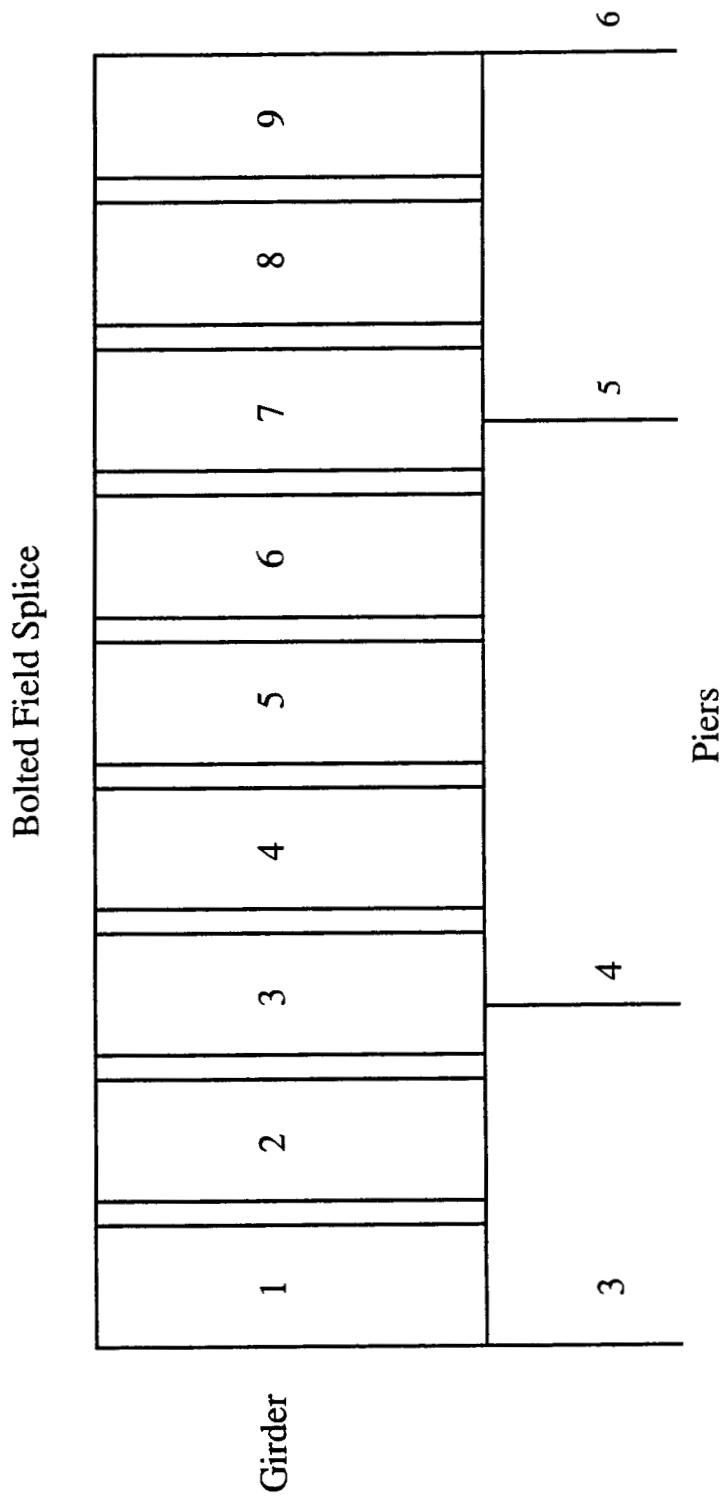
(d) Schematic Illustration of the Box Beam Girder Sections Bolted Together to Make Up the Main Channel Crossing Structure
